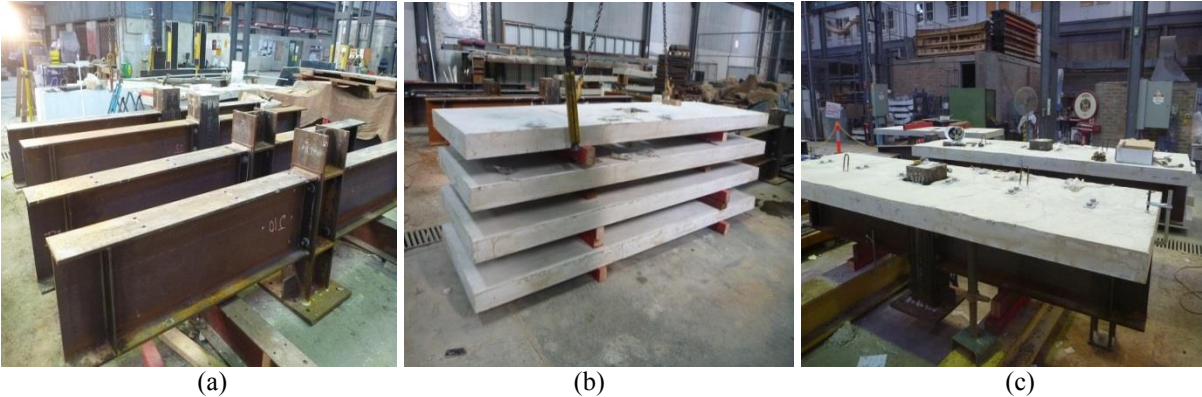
(a) Assembled cruciform steel joints before installation of precast concrete slabs; (b) precast concrete slabs after de-molding; (c) specimens CJ1 and CJ2 ready to be tested.
